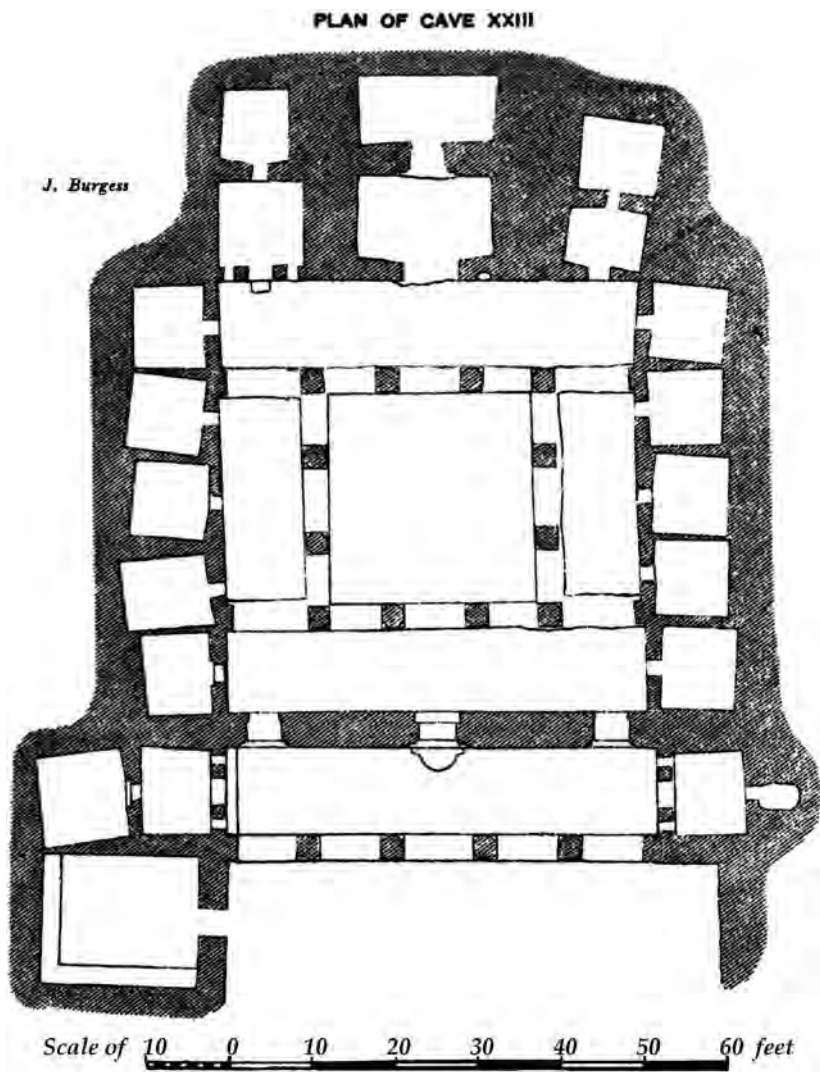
Ajanta Cave 23 plan (BCT 34)
